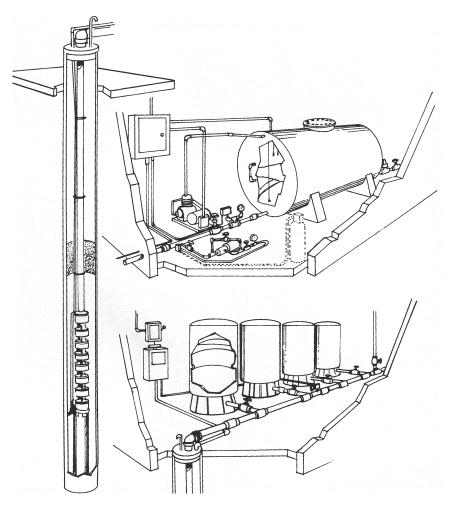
Typical high capacity submersible pump installation. Header pipe must be large enough to get enough water to all tanks equally. © *ITT Goulds Pumps.
